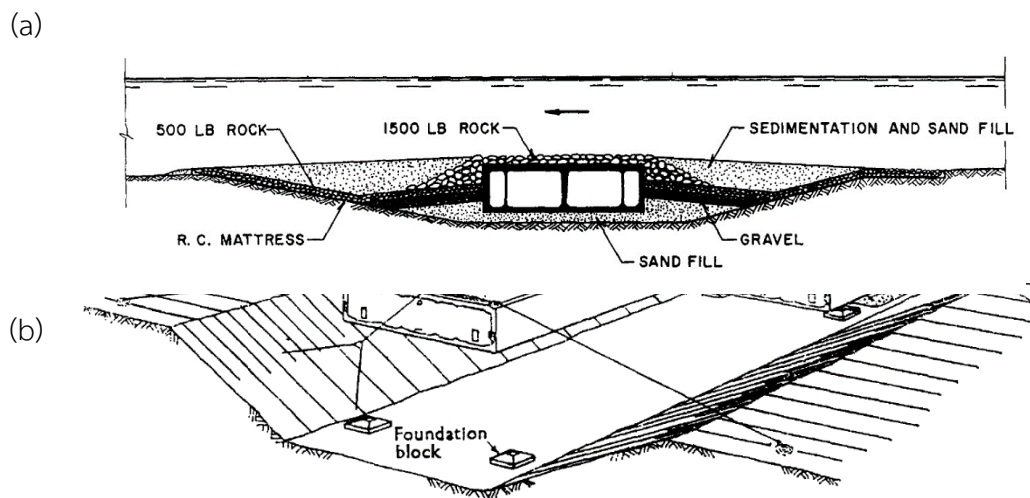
Precast tunnel construction; (a) Laying process of tunnel segment; (b) Cross-sectional tunnel
